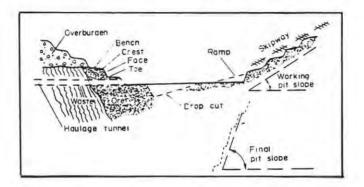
Open pit mining terminology (from Peters, 1989)
